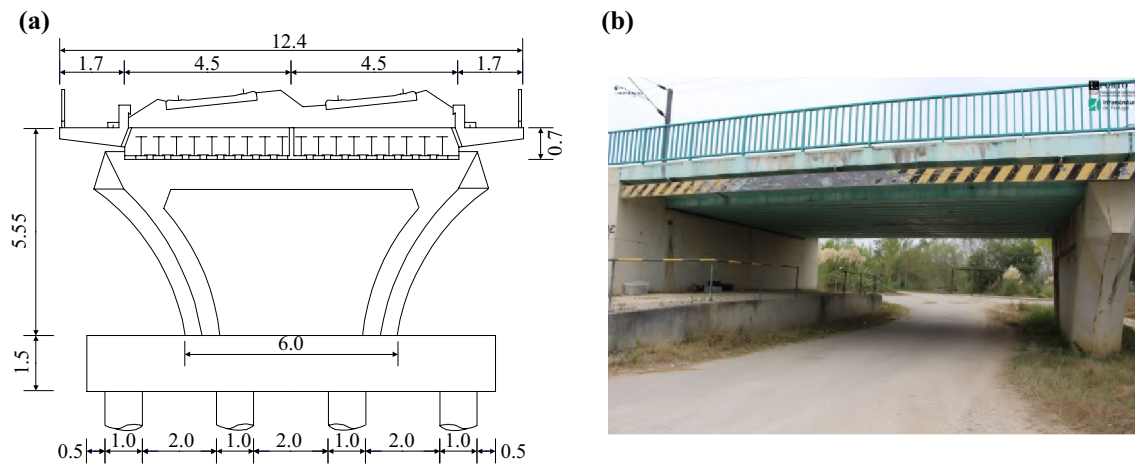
Canelas bridge (unit: m): a cross section (adapted from [24]); b view of the first span
